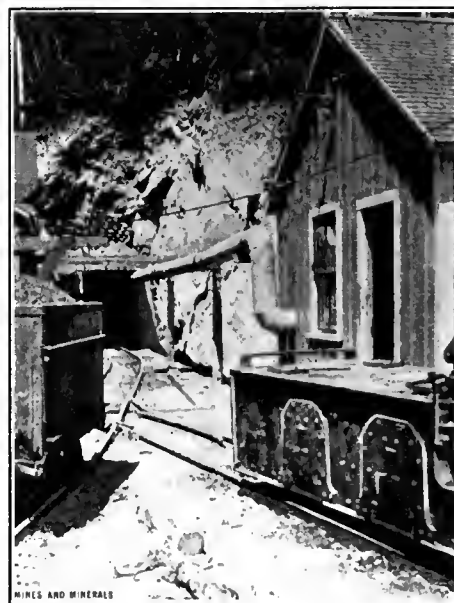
PORTAL AND FAN HOUSE, UTAH METALS CO. TUNNEL
